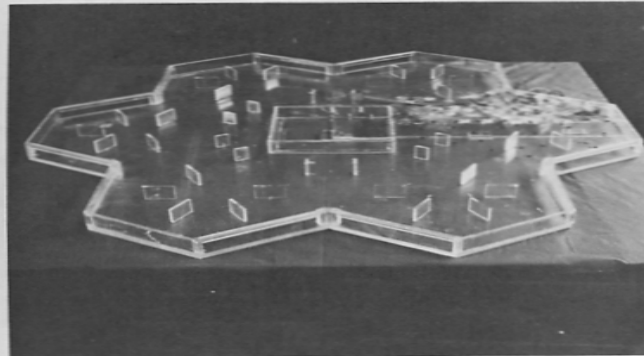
Reinforced concrete flat plate floors of high-rise apartment supported by an array of shear wall columns (1/30 scale)—Fling
